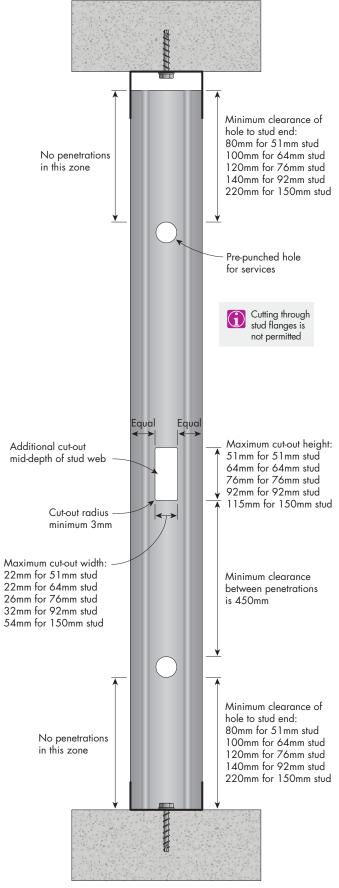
Stud Cut-out Tolerances Non-load bearing walls only Section
